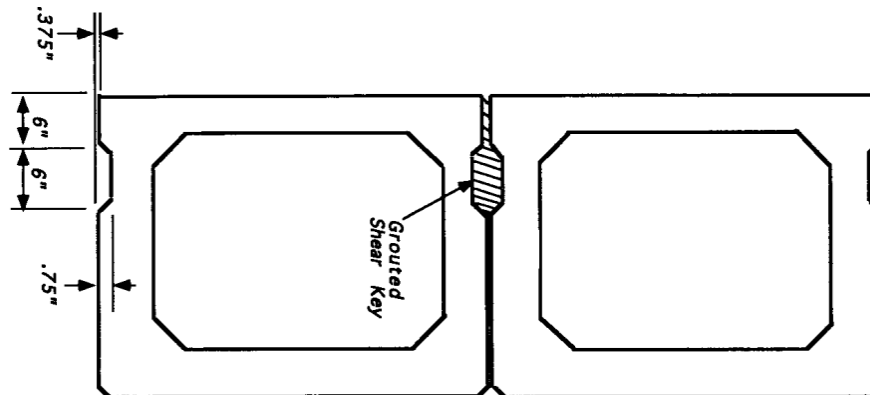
Grouted Shear Keyway Detail for Adjacent Box Girders (retrieved from Huckelbridge et. al., 1995)
